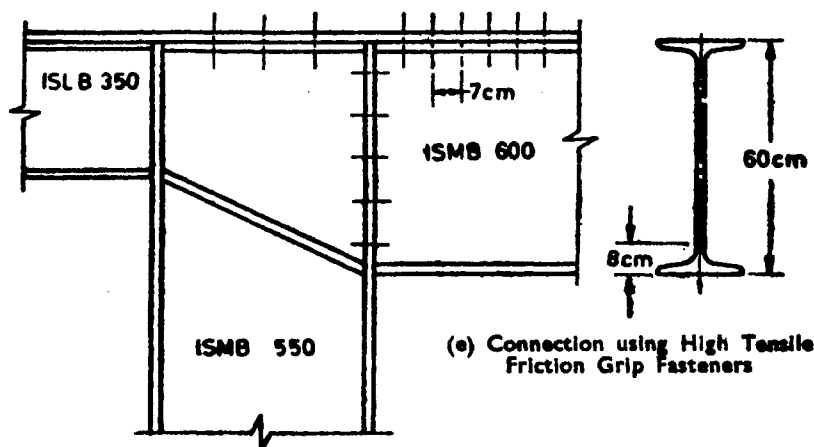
BEAM TO COLUMN CONNECTION WITH STIFFENERS
